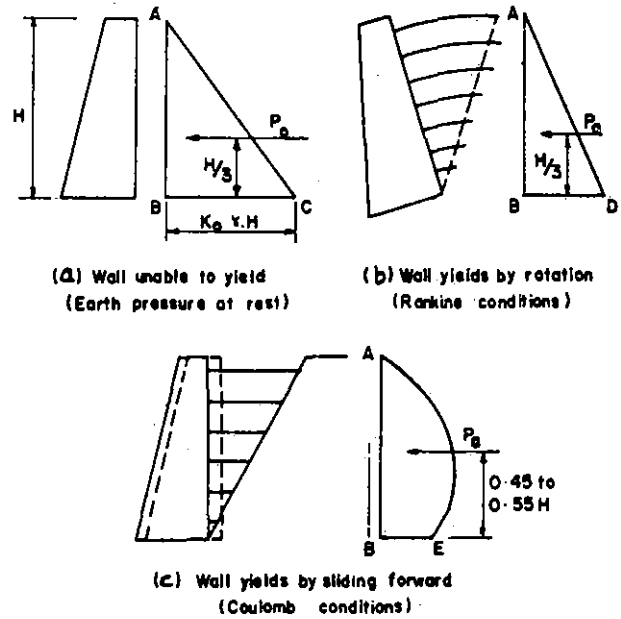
Influence of wall yield on pressure distributions behind a retaining wall
